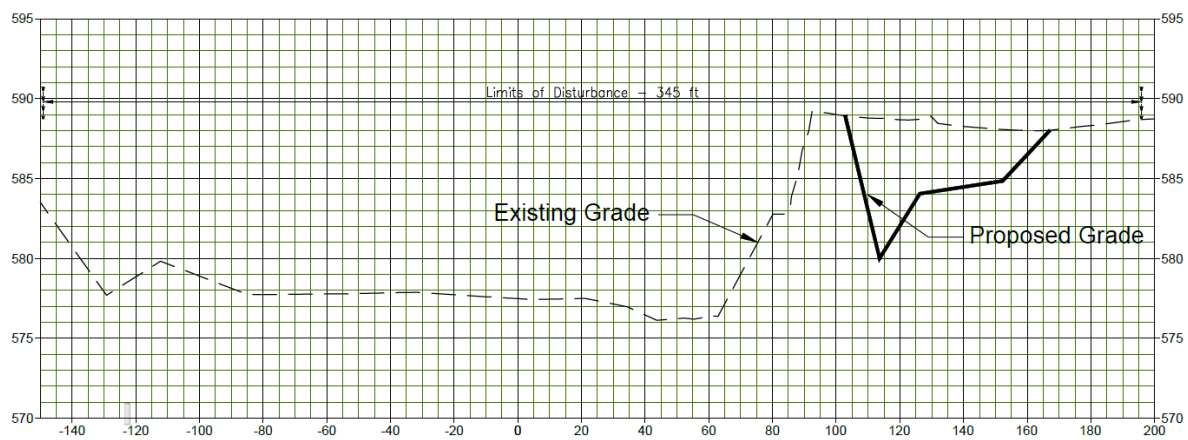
Cross-Section #1 Station 13+88.56' showing the difference between existing bank and deformable bench.
